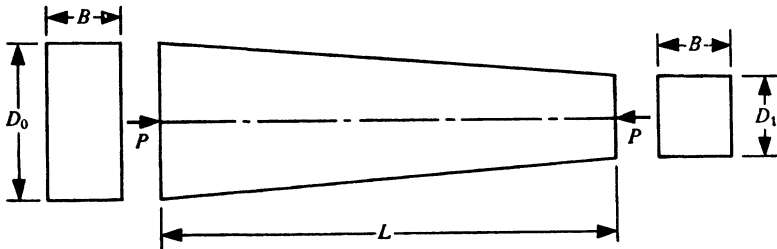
Tapered Beam of Rectangular Cross-Section under Axial Compressive Load.
